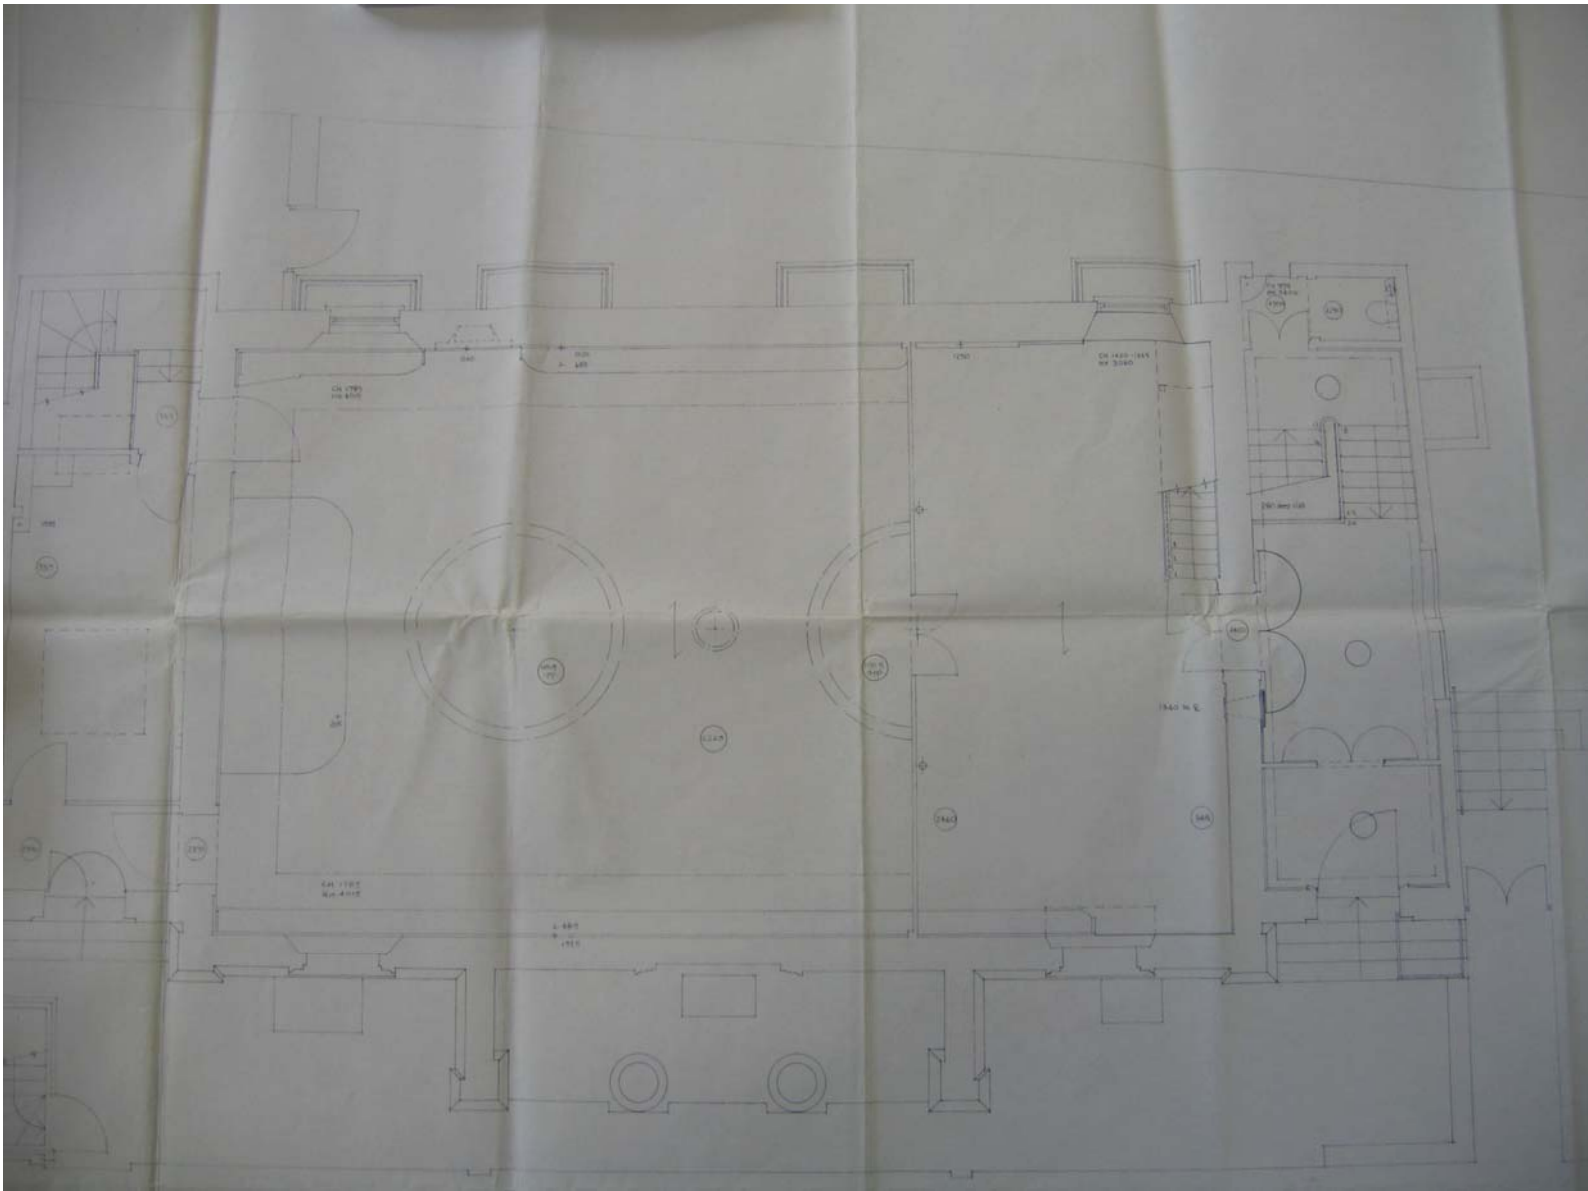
(BaRO: Building Control Records - Ground floor Plan Survey Date 12/78 Drawing 174 (A) 2 by Derek Stollar)
